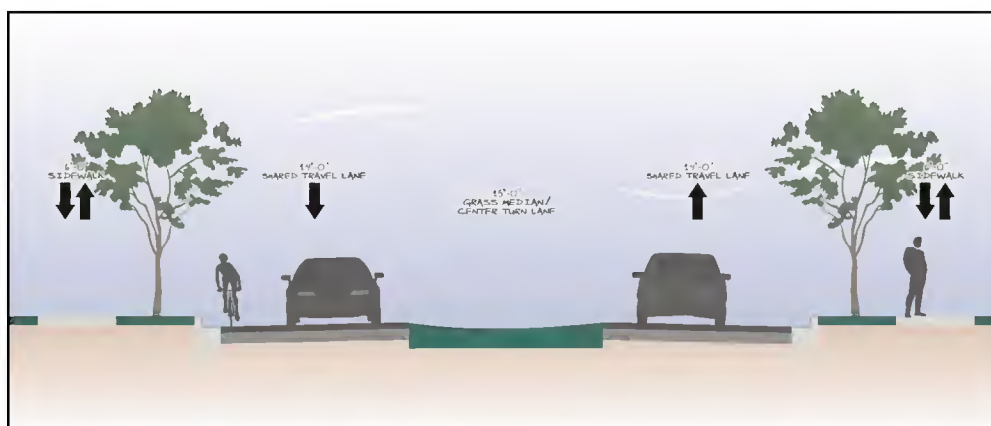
Minor Arterial Conceptual Cross Section
